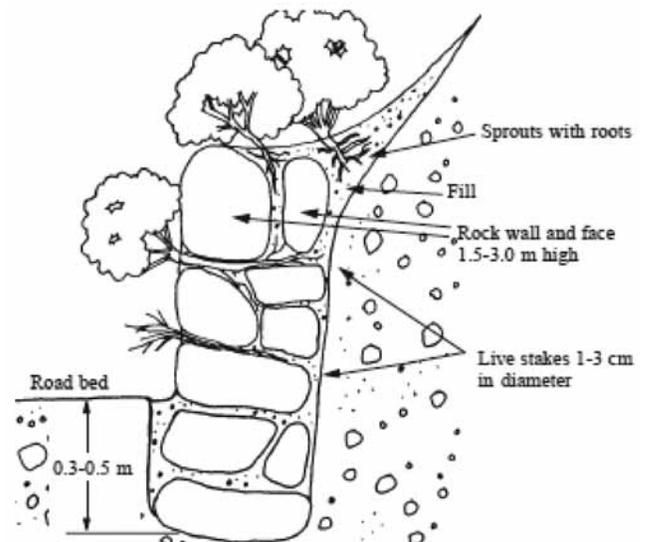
Cross section of a vegetated rock wall (Keller and Sherar 2003).
